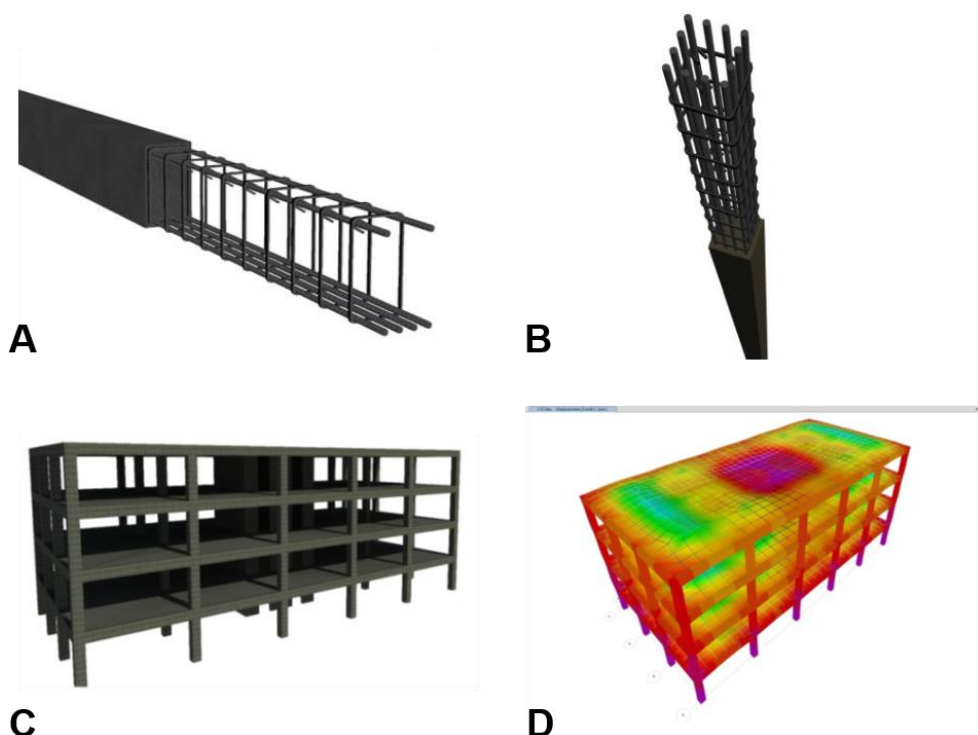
3D renditions of structural components and hypothetical building model. (A). Reinforced concrete beam that illustrates the horizontal load bearing structural component with longitudinal and shear reinforcement to resist flexure and shear, respectively; (B). Reinforced concrete column that illustrates the vertical load bearing structural component with vertical reinforcing bars and stirrups to transfer the load from slabs and beams to the foundation; (C). Hypothetical building model developed using Revit that illustrates a typical reinforced concrete building, with RC slabs, RC beams and RC columns, which is subjected to standard loading and site conditions; and (D). ETABS model of the hypothetical building that illustrates the structural response after performing the structural analysis.
